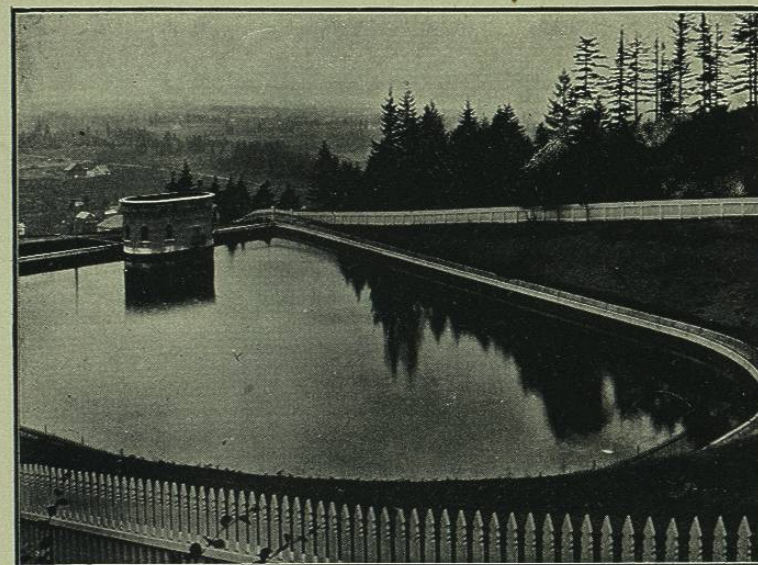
RESERVOIR NO. 1, PORTLAND, ORE., WATERWORKS. CONCRETE DAM WITH EARTH BACKING.
